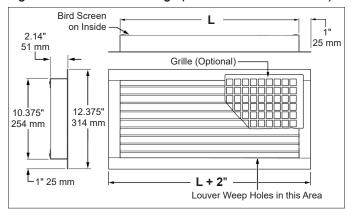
Louver Without Flange (Horizontal Blades Shown)
